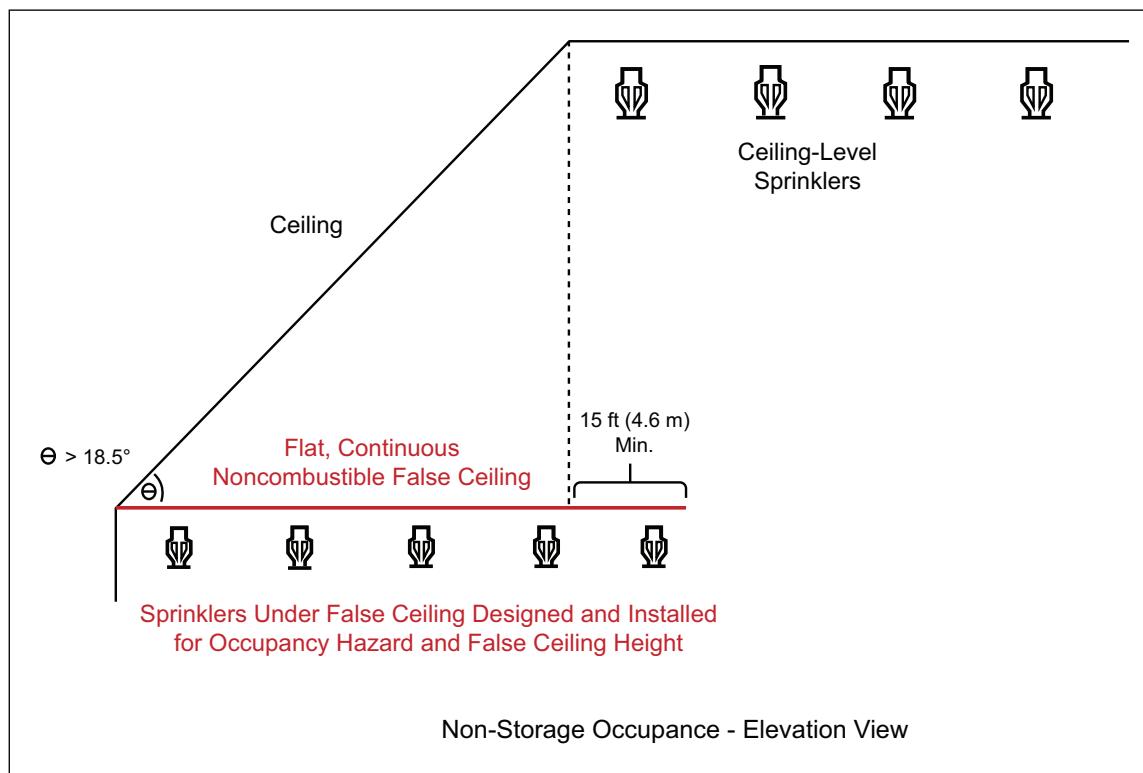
(c). Recommended sprinkler installation per Figure 2.5.2.3.4.1(a) when ceiling slope exceeds 4 in 12 (18.5°)
